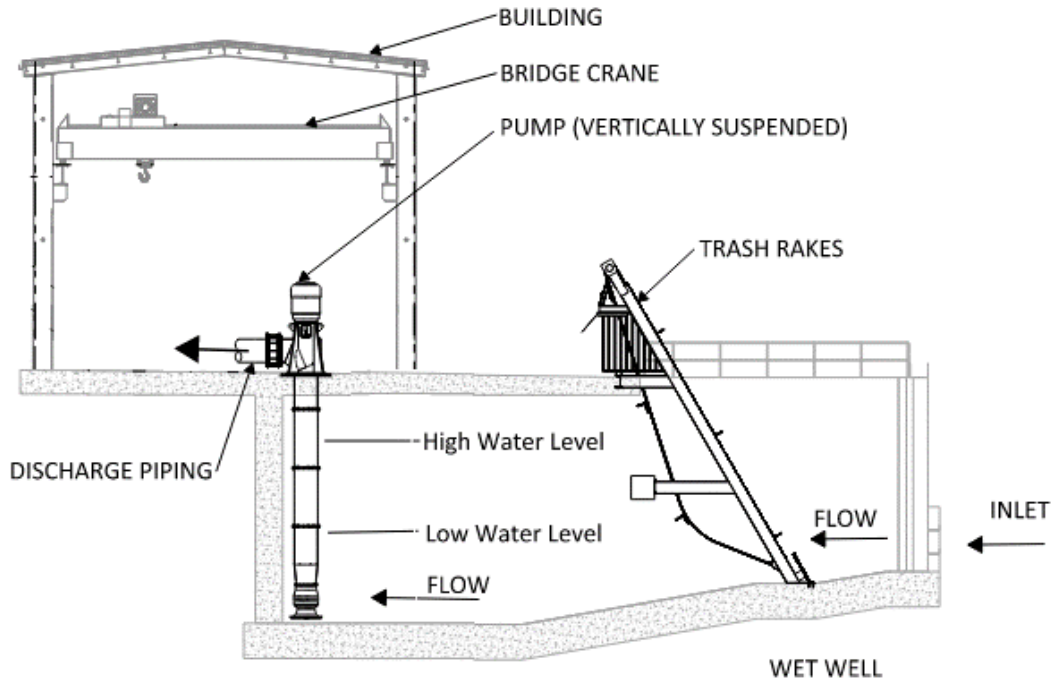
Example of Vertically Suspended Pump Dry Setting Pump Station
